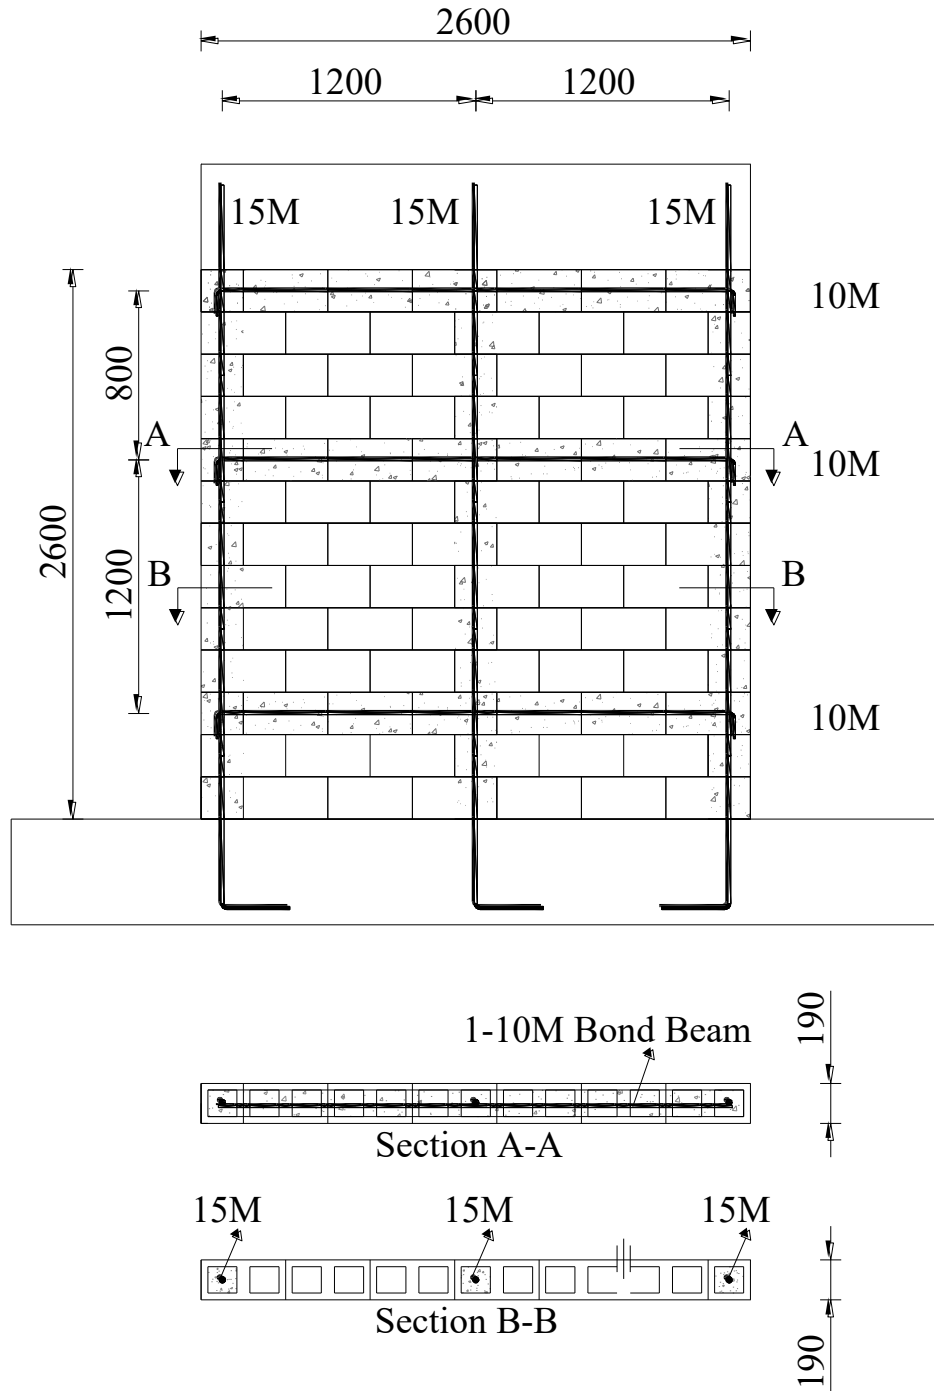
Reinforcement layout of the squat wall with BB reinforcement
